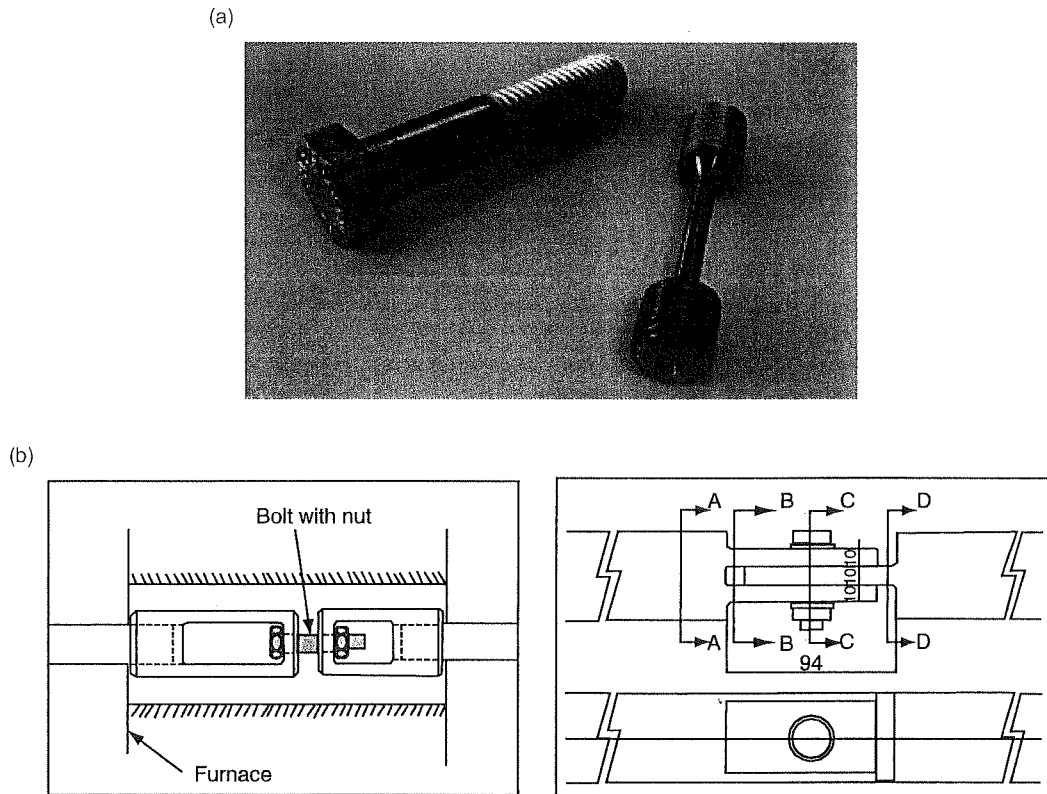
(a) Intact bolt and specimen machined to characterize the bolt material, (b) Test set-ups for tensile and shear tests performed on bolts.
